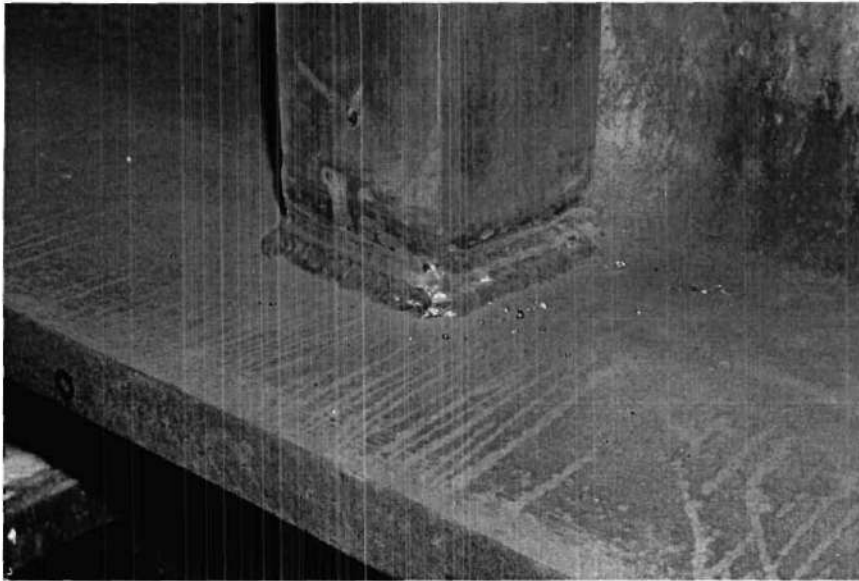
Welding of Bottom Anchorage Block
